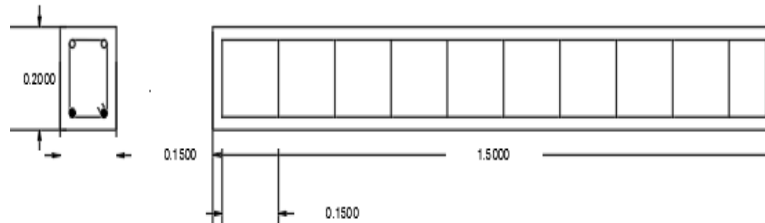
Sectional View of concrete beam (all dimensions are in meter).
